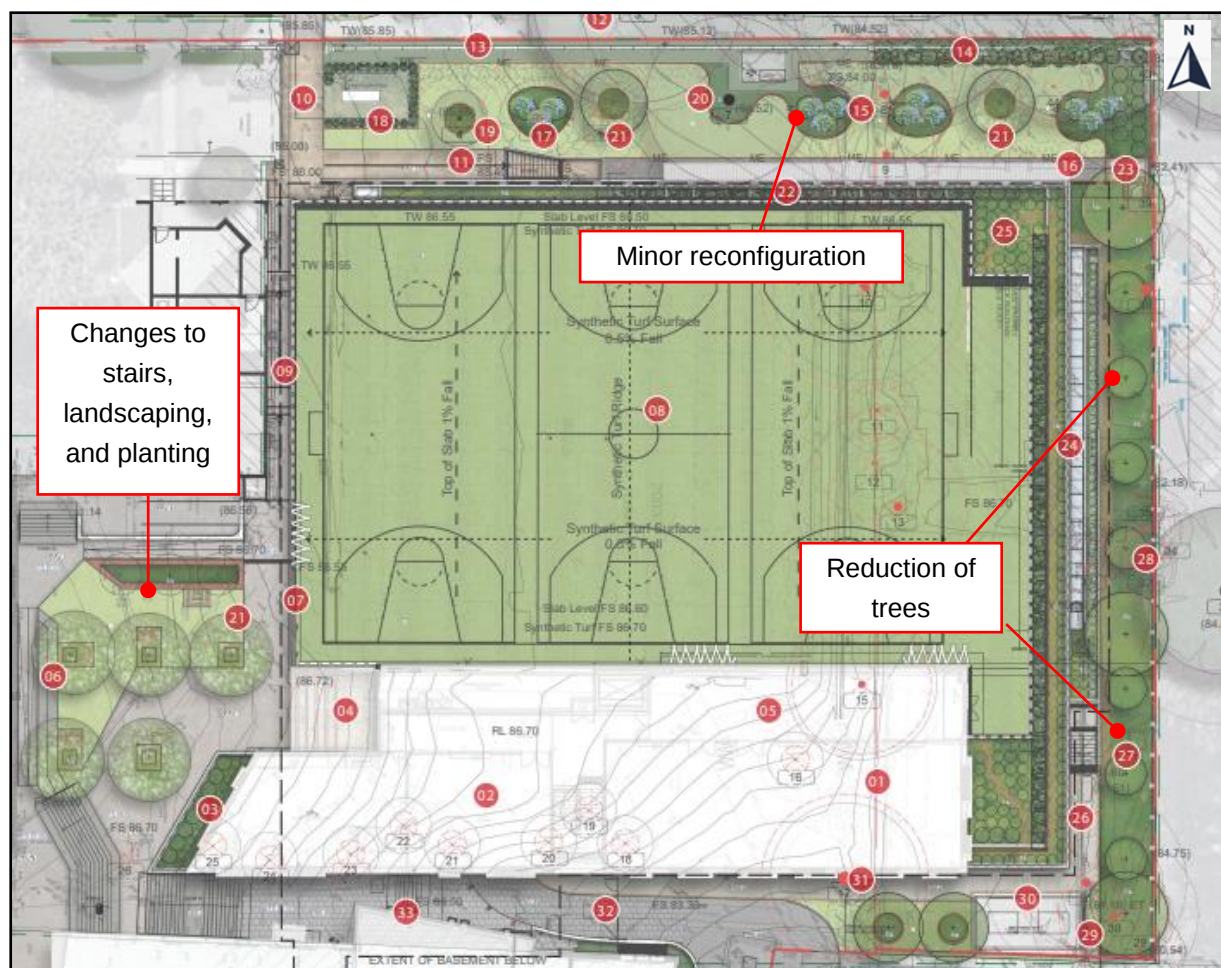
| Proposed modifications to the landscape plan (Source: Applicant's additional information 2022)
